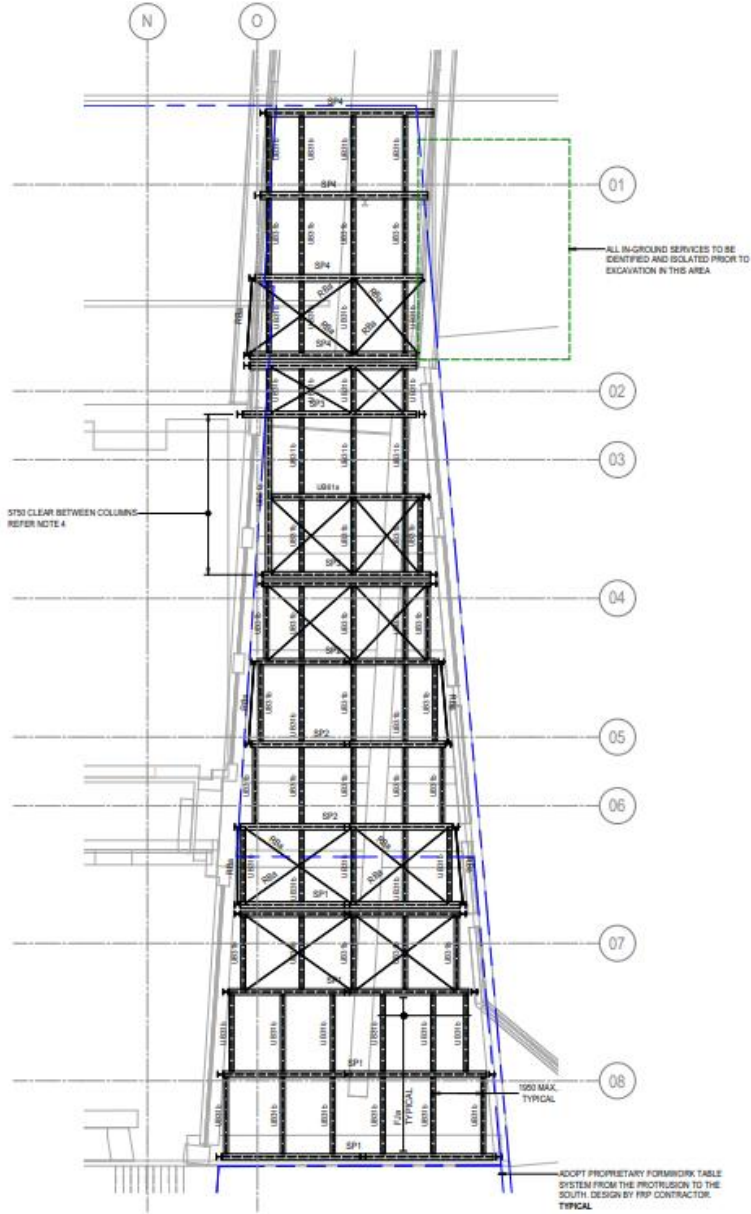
B-Class Hoarding Temporary Engineering Plan – Devonshire St Tunnel
